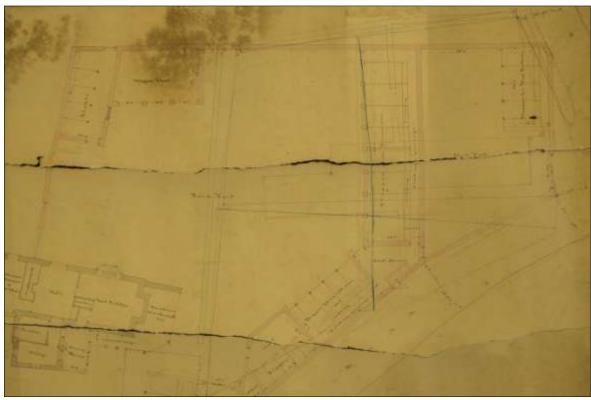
PLANS FOR THE REBUILDING OF THE FARMSTEAD AT 'PARK FARM' DRAWN UP BY R.S. CORNISH (DHC 2065ME3/26).
